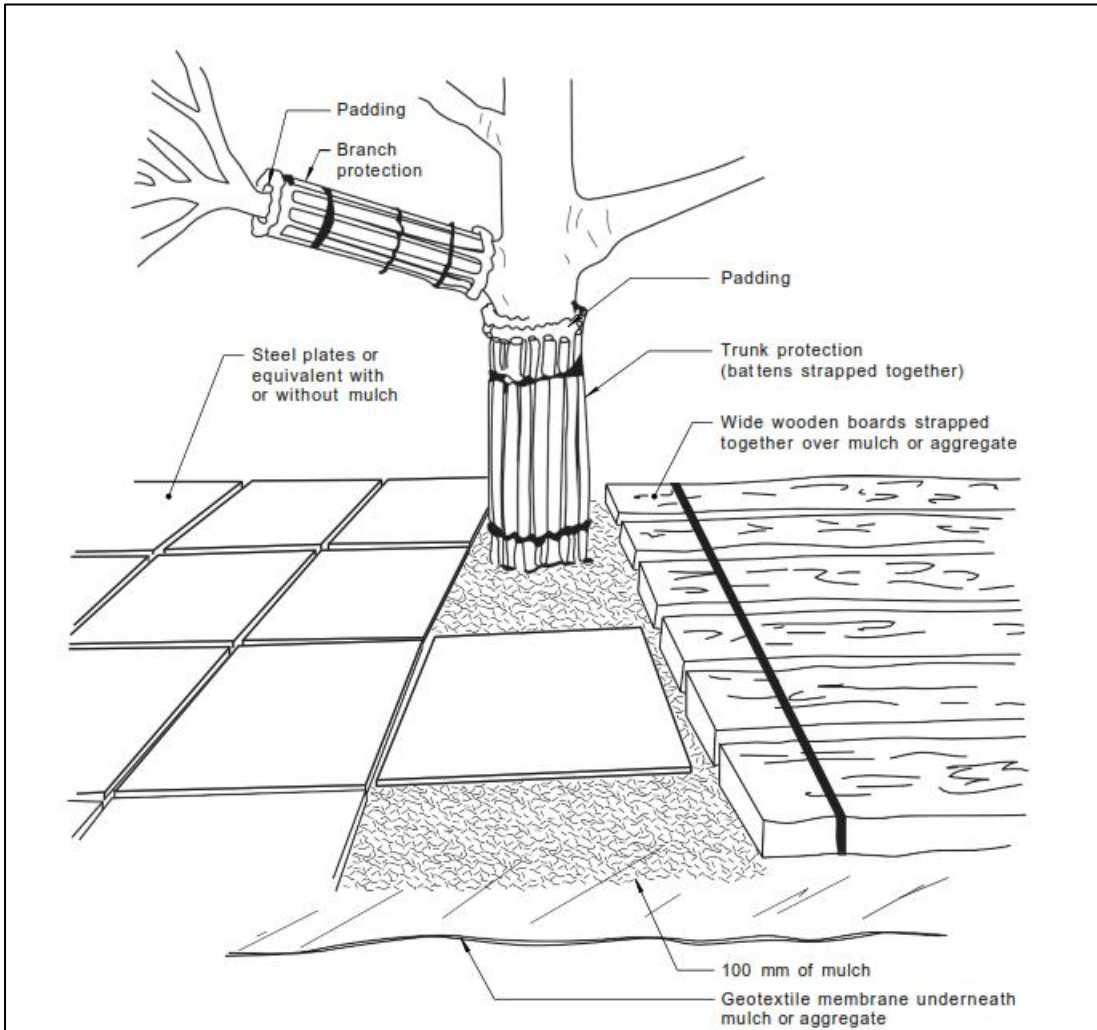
Ground Protection Measures to be installed on site where access for trades is required.
